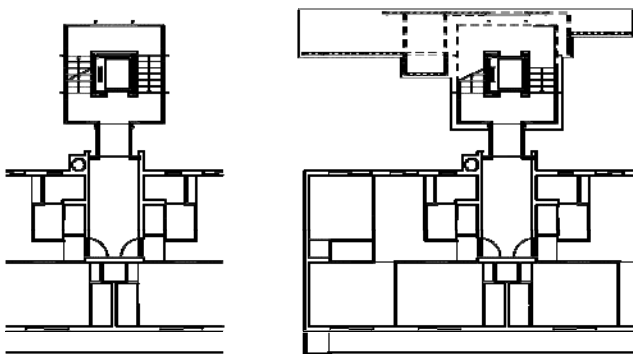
Typical Floor Plan and Ground Floor Plan of the Experimental Elevator Addition System
